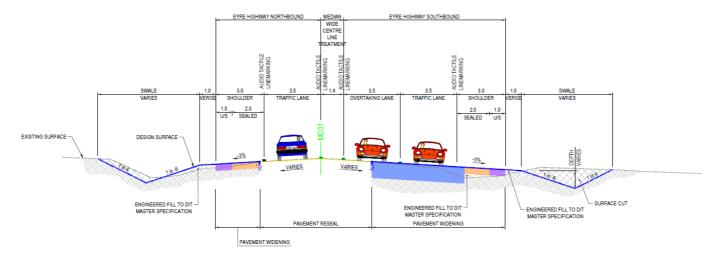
Typical cross section, section taken at MC01 CH 700 (looking north).
